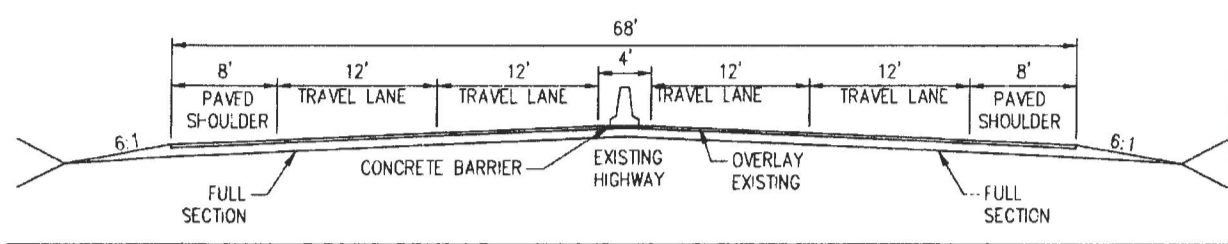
Millican Road to downtown Prineville basic roadway cross-section.
